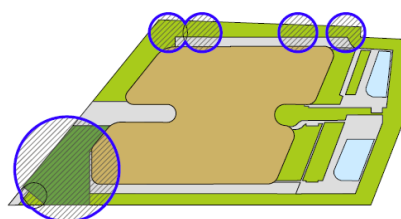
Test site 14 – Residential flat development on 900m² + site area (Woollahra Council diagram)
